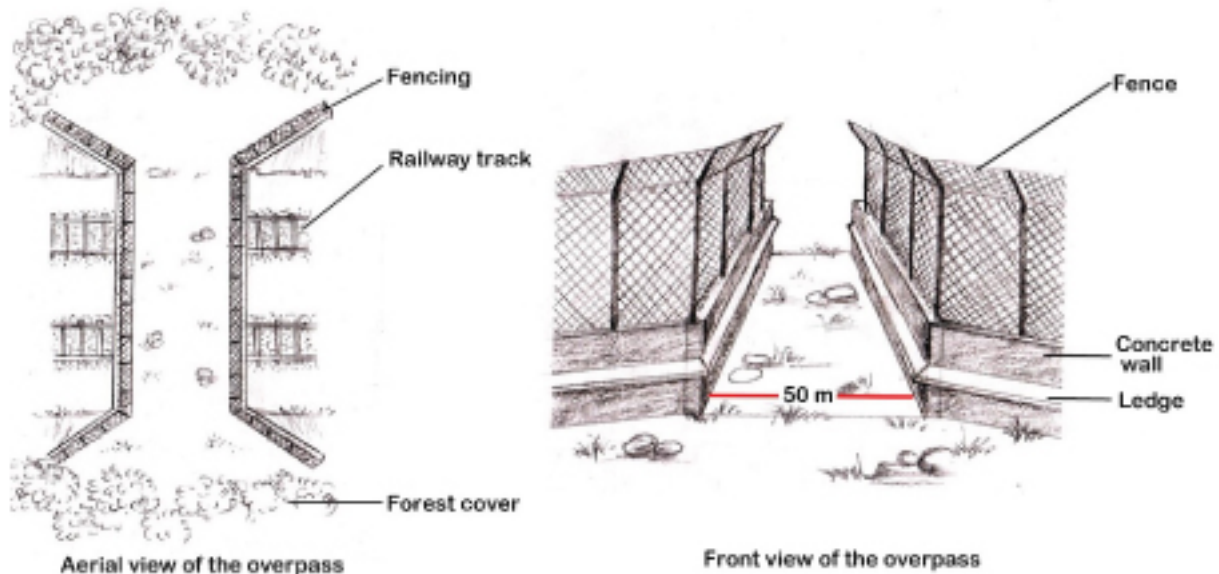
Aerial and front view of overpasses on railway tracks, with fencing/noise and sound barrier details.
